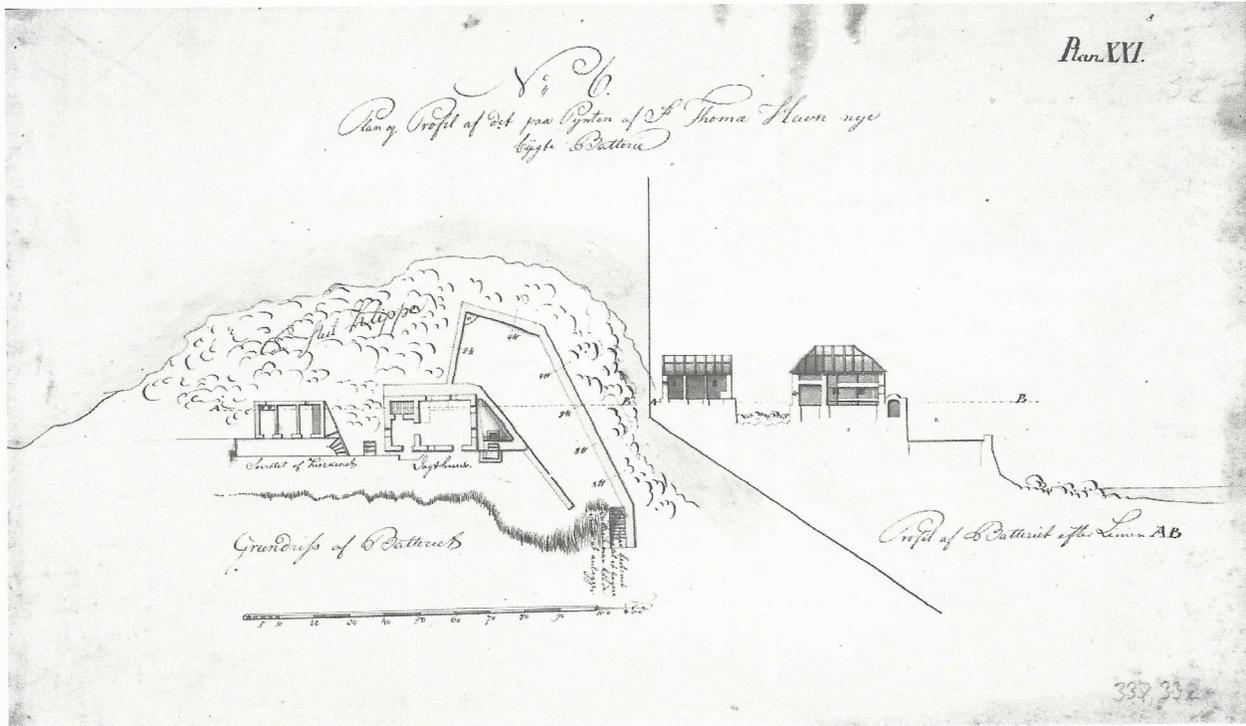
Plan and elevation of Prince Frederik's Battery 1780
